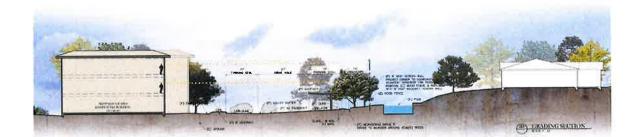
BUILDING SITE SECTION (CIMARRON HILLS-SOUTH)
